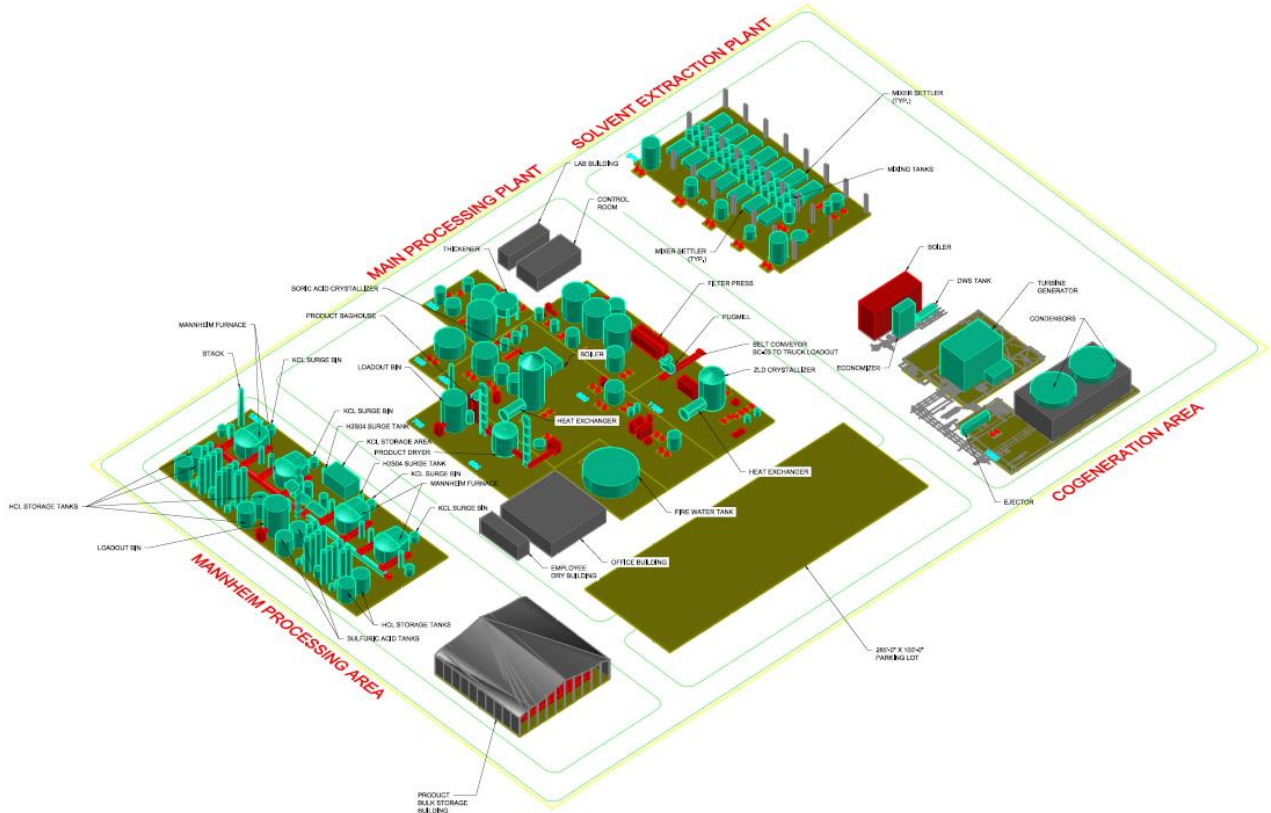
3D rendered view of the plant arrangement (From left to right: SOP plants, main plant, SX building and Cogen)
